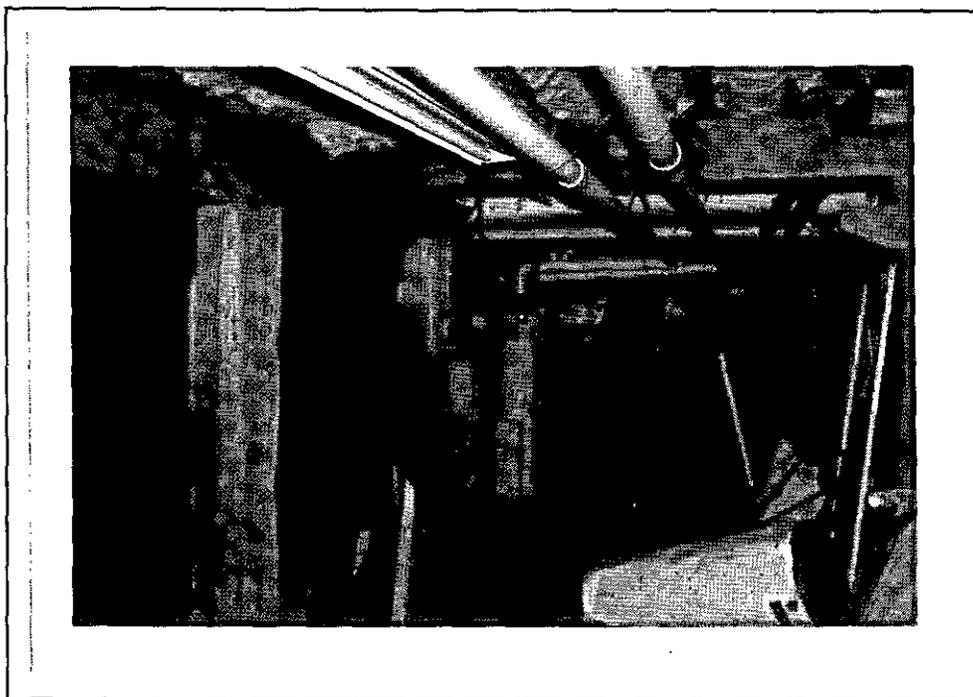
Willow Grove Mill (N-5215), Interior Detail of Older Section Basement, Showing Central Row of Posts Supporting Summer Beam
